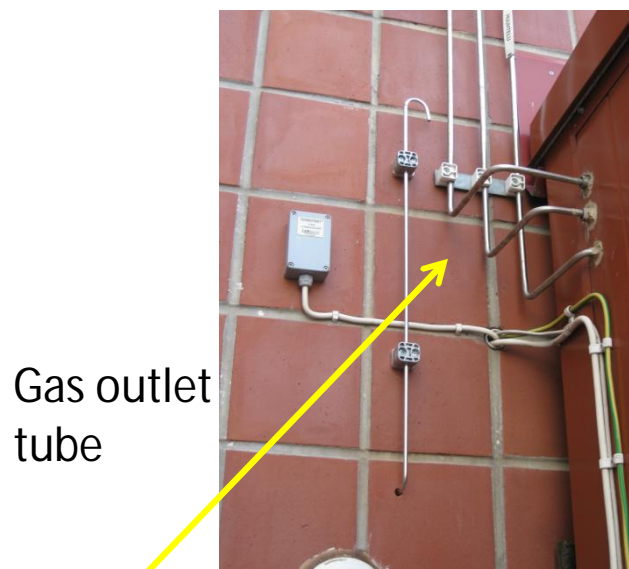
Gas outlet tube connected outside to avoid burning gas collection inside the laboratory.
